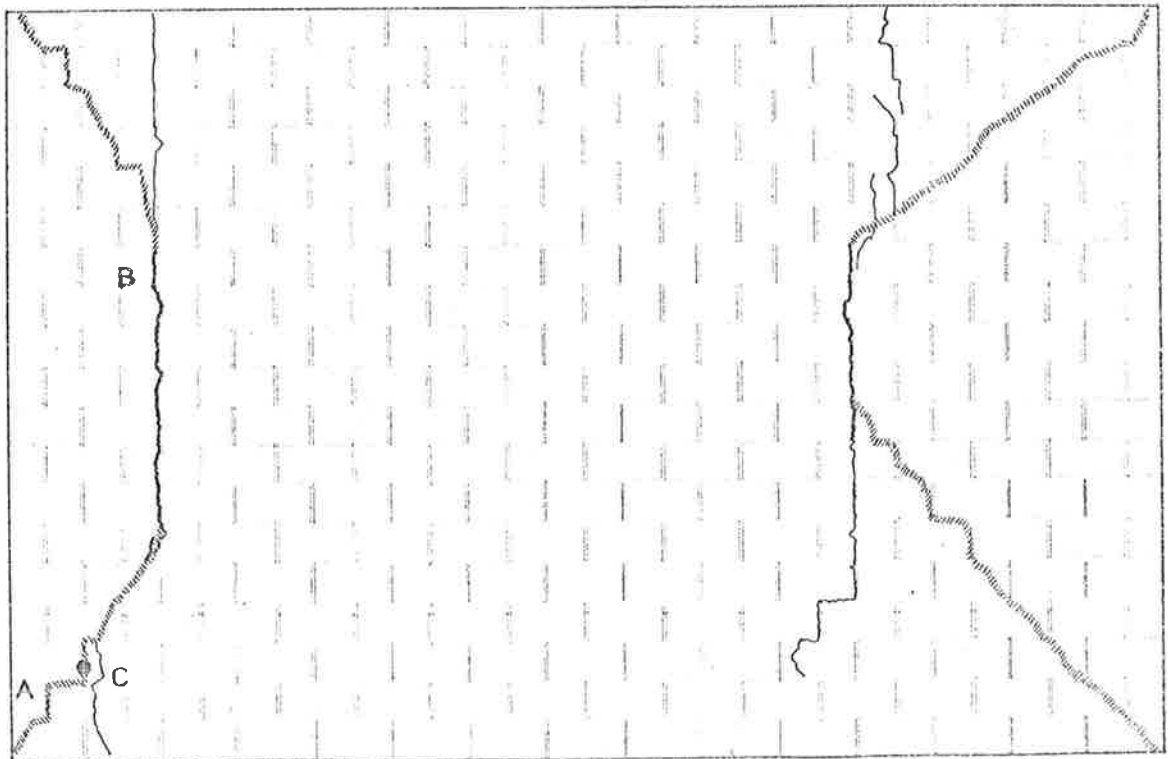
(b): West Face (Hatching denotes brick spalling)
